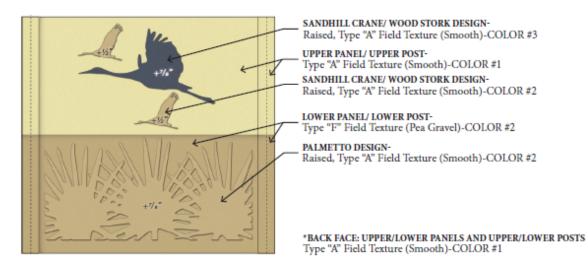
Typical precast wall panels (raised impressions shown are only to be supplied at locations shown on drawings)
